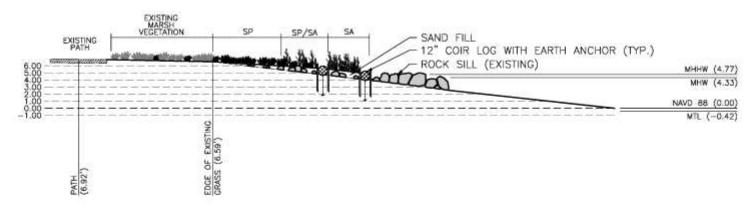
Collins Cove esign Section STA 4+00 SALEM, MA
